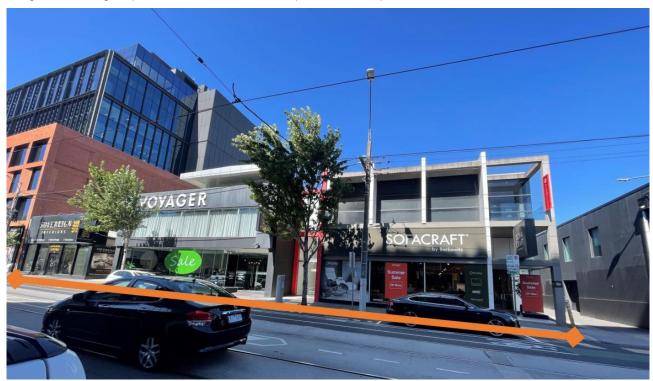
the subject site's frontage to Church Street, with No. 459 – 471 Church Street to the left, and the Sanders Place entry to the right (Officer site visit, February 2024)
